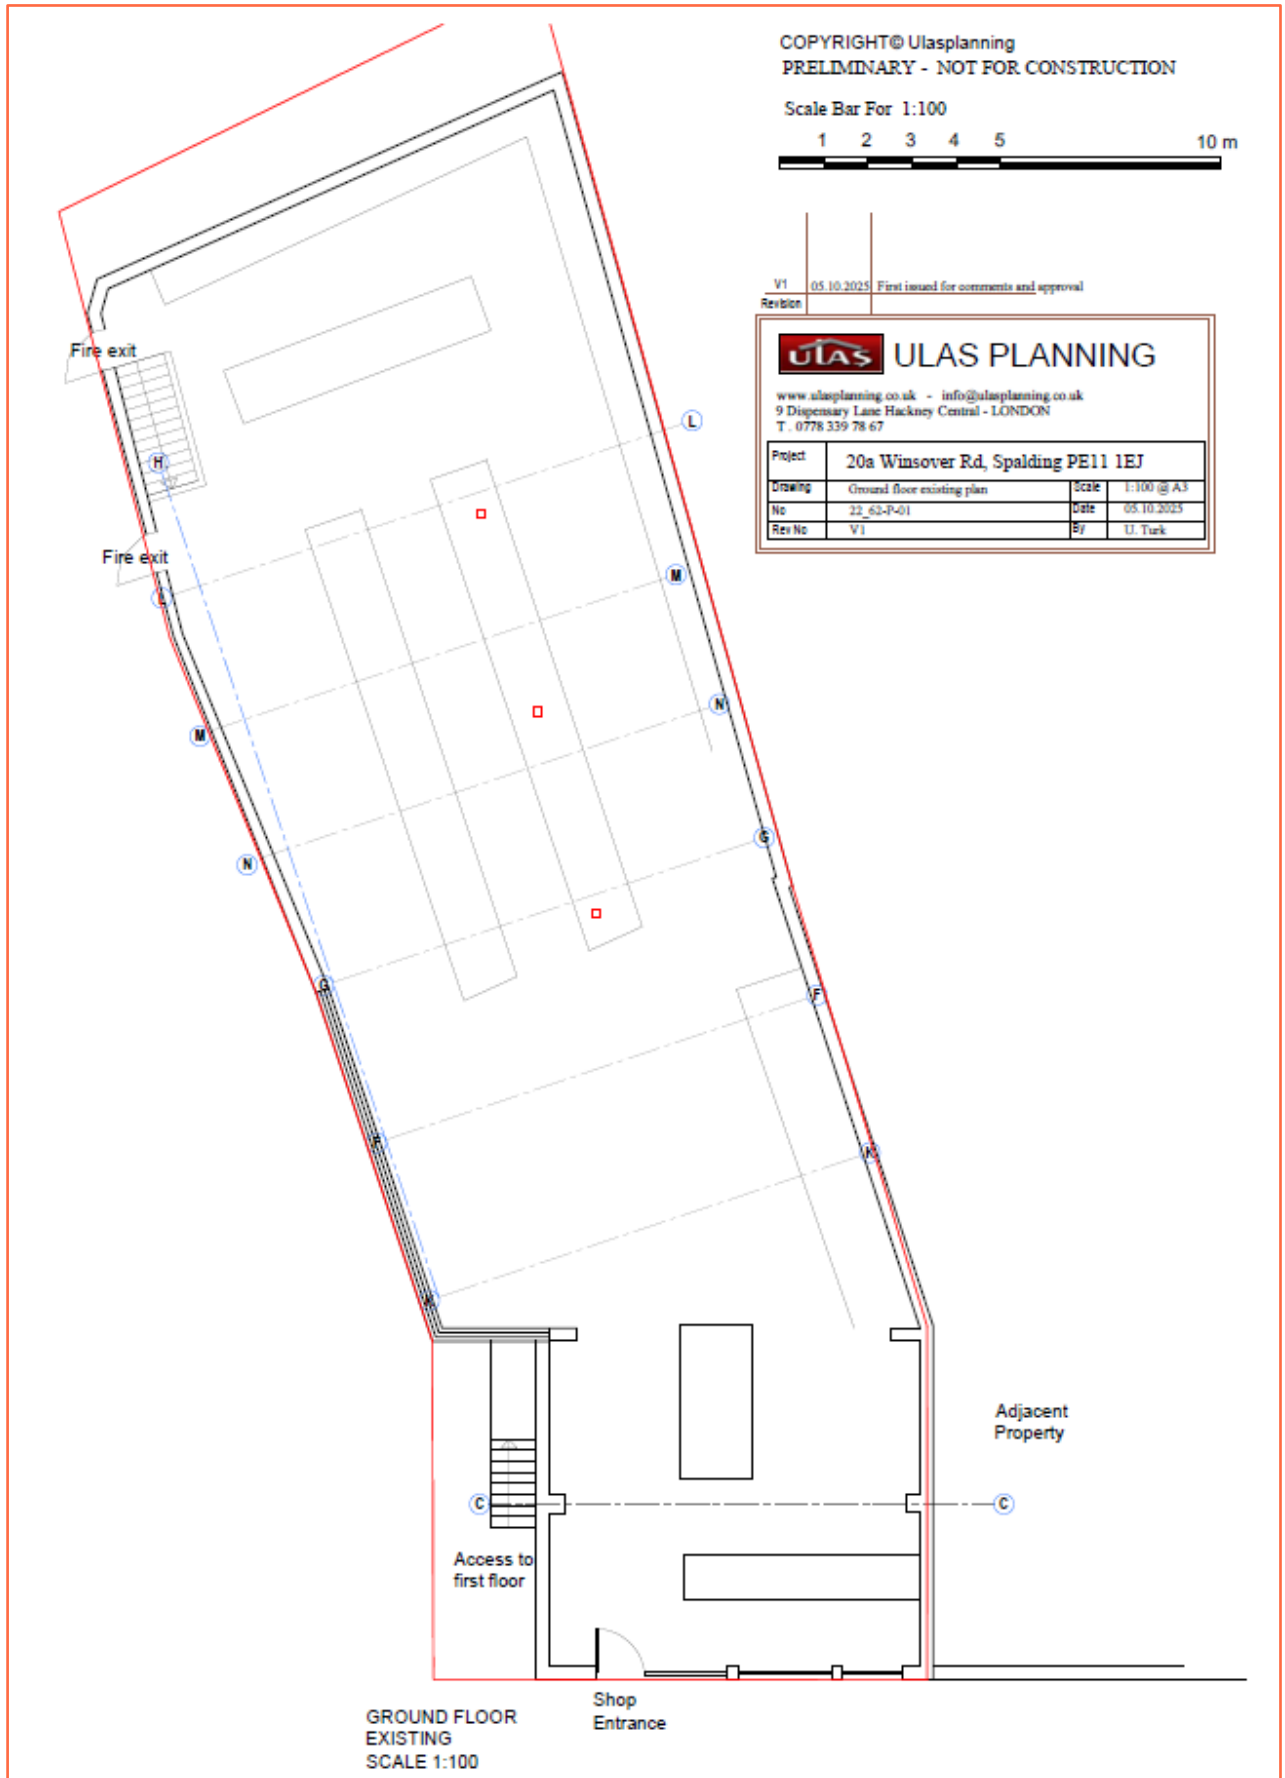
Existing ground floor plan (Source: ULAS Planning)
